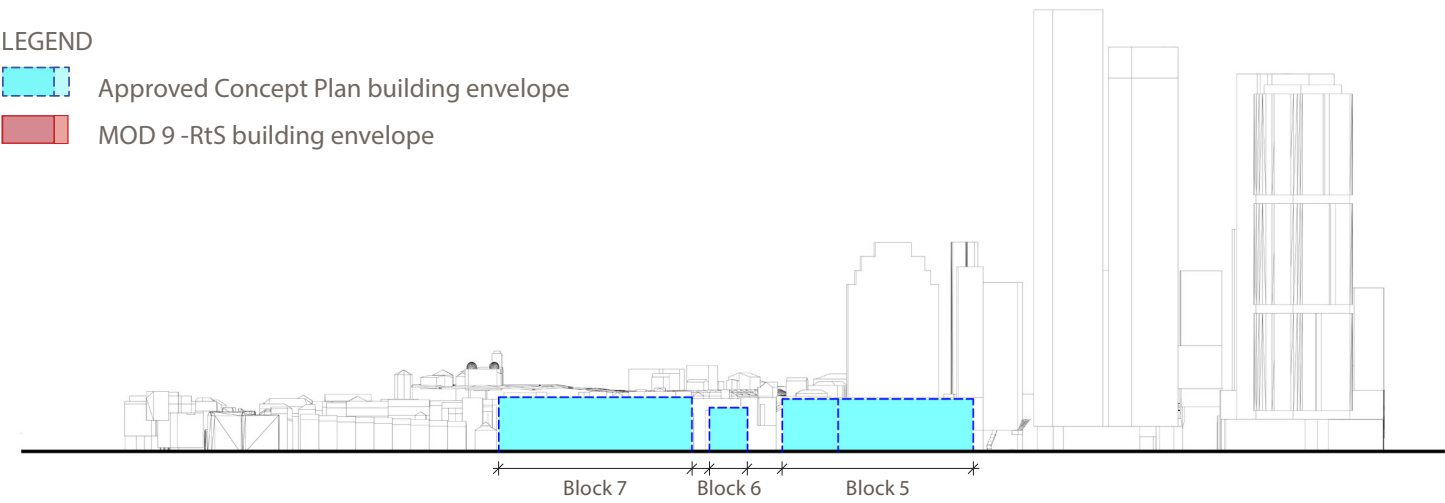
Figure C Elevation Looking East - Approved Concept Plan (Source: Modified from SJB diagrams July 2023)
